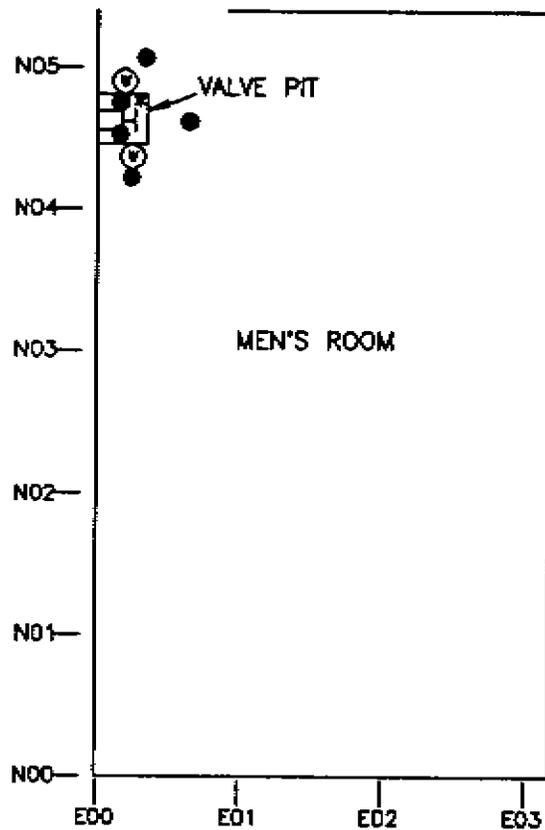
Building 17, First Floor Men's Room, Valve Pit, Indicating Measurement and Sampling Locations
